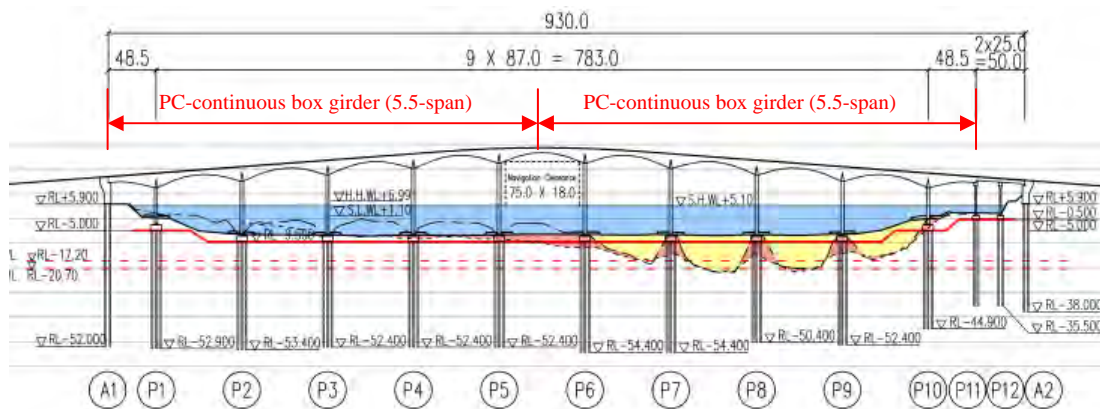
Concept of Continuity in Meghna Bridge Girder
